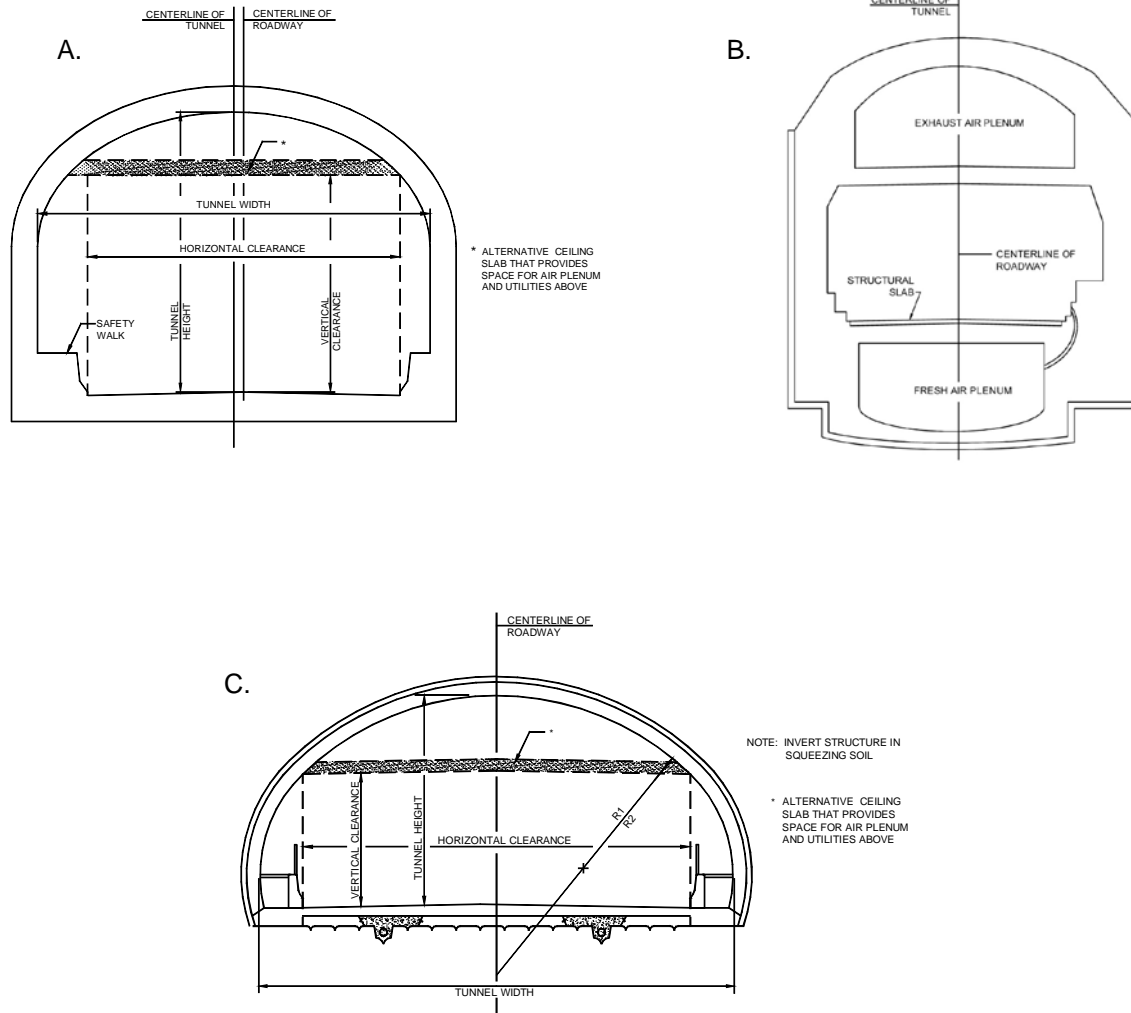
A) Horseshoe tunnel with two traffic lanes and one safety walk. B) Also shown is an alternative ceiling slab. The invert may be solid concrete or a structural slab that provides void space to meet ventilation and/or drainage requirements. C.) Oval tunnel is shown with three traffic lanes and two safety walks. Also shown is alternative ceiling slab. With this approach, the lower portion of the tunnel may be curved to more effectively resist the ground and/or groundwater pressures. The invert may be solid concrete or a structural slab that provides a void space to meet ventilation and/or drainage requirements.
